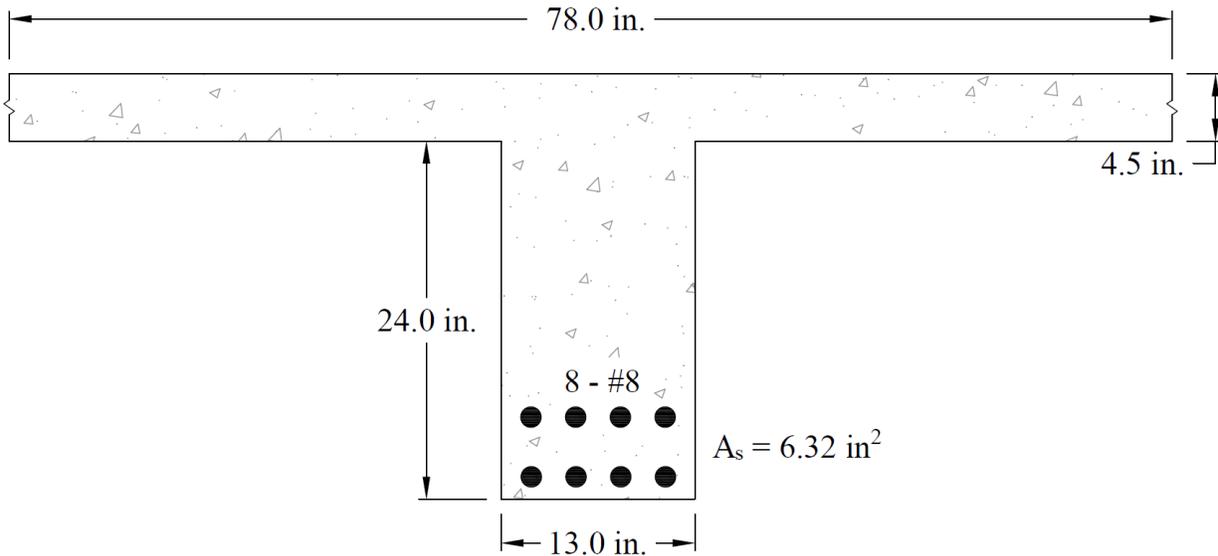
Flanged Reinforced Concrete Beam (T-Beam) Cross-Section
